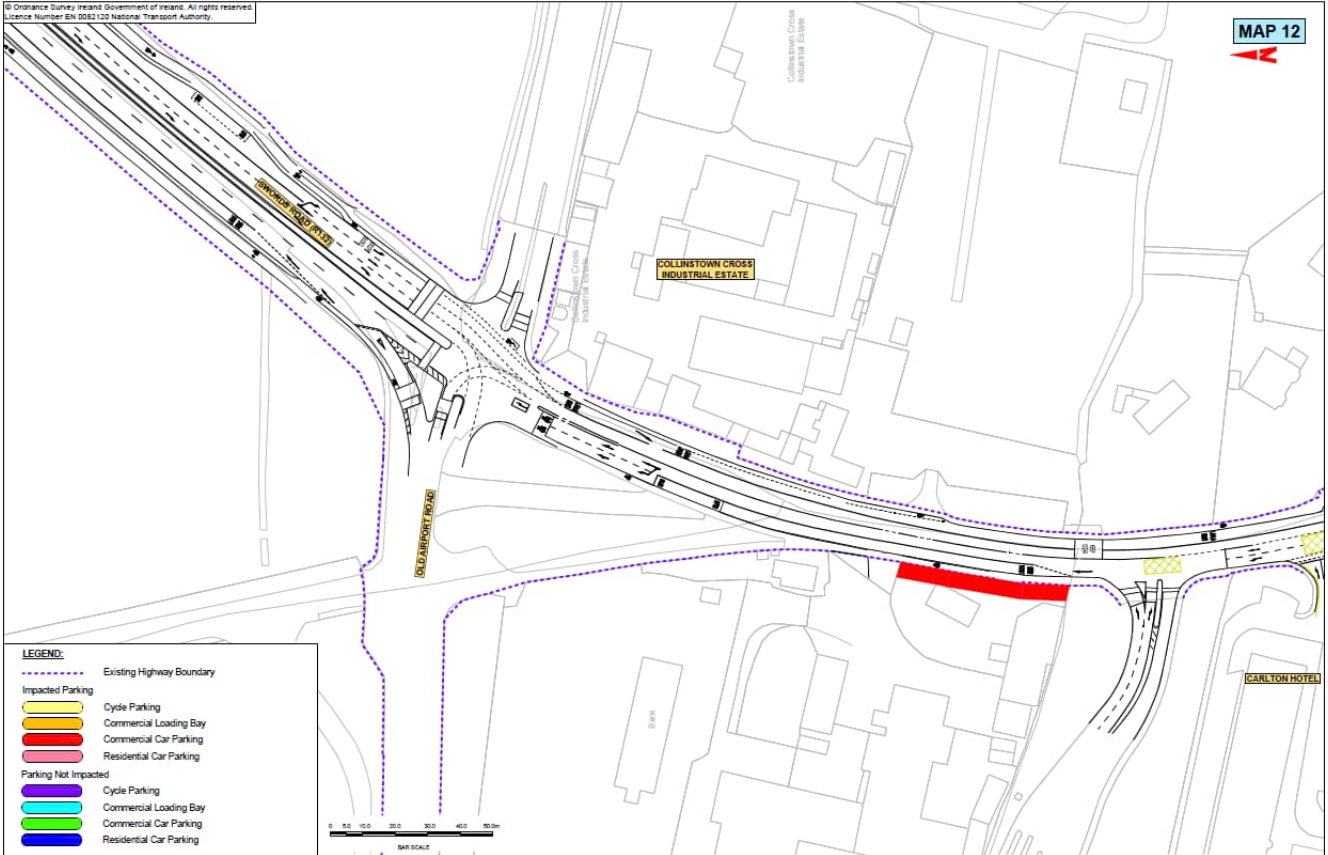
Paddy Shanahan Cars, Swords Road / Old Airport Road
